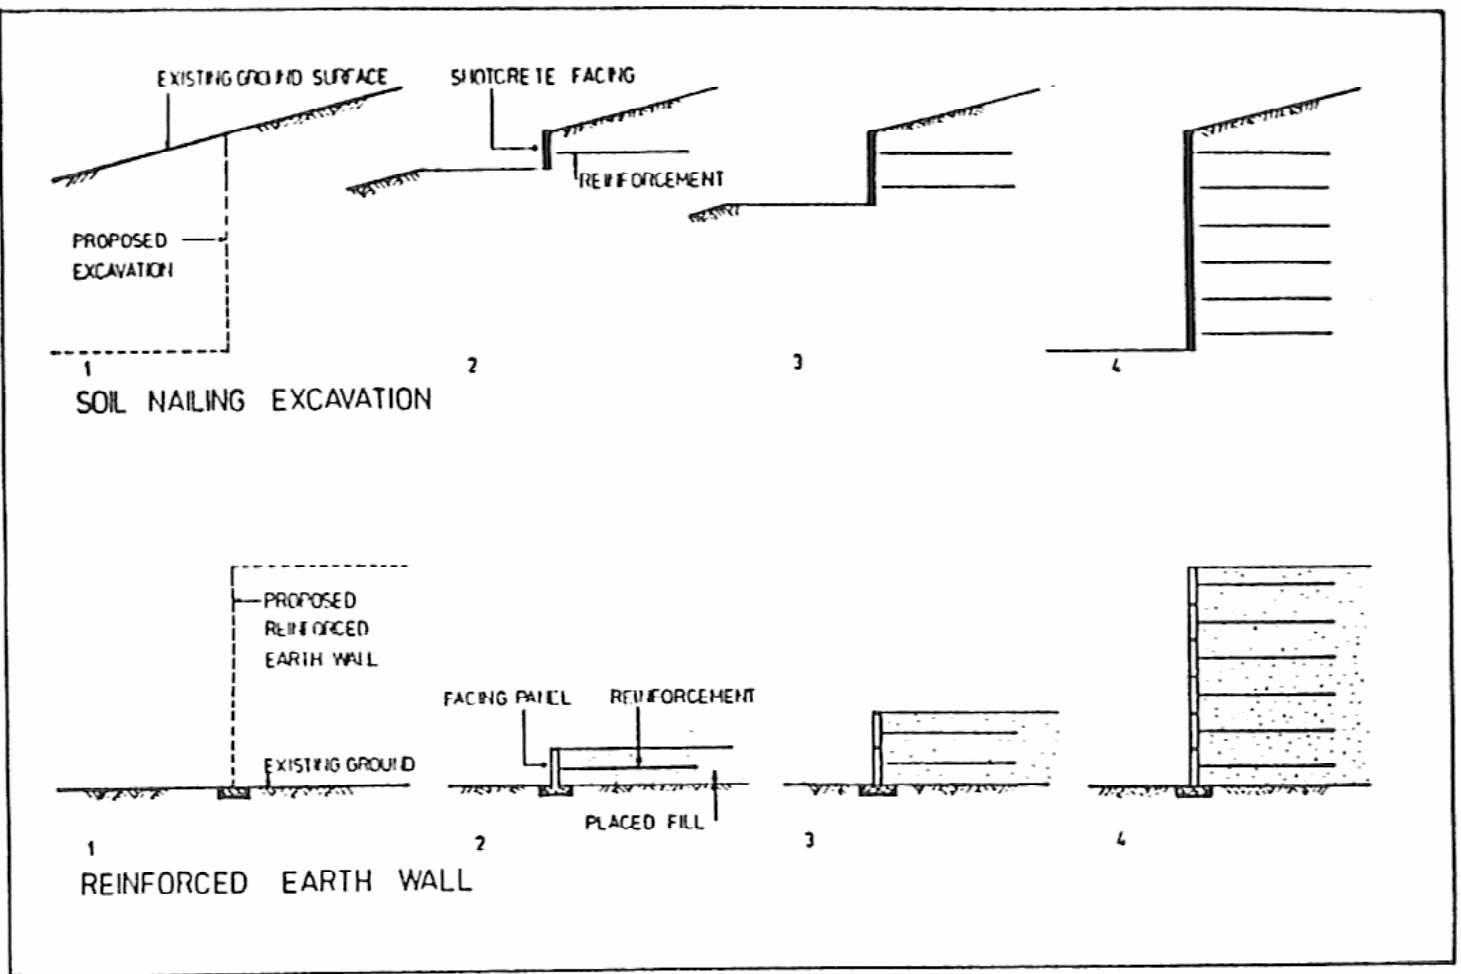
Contrasting Construction Sequences for Soil Nailing ("top down") and Reinforced Earth ("bottom up")
